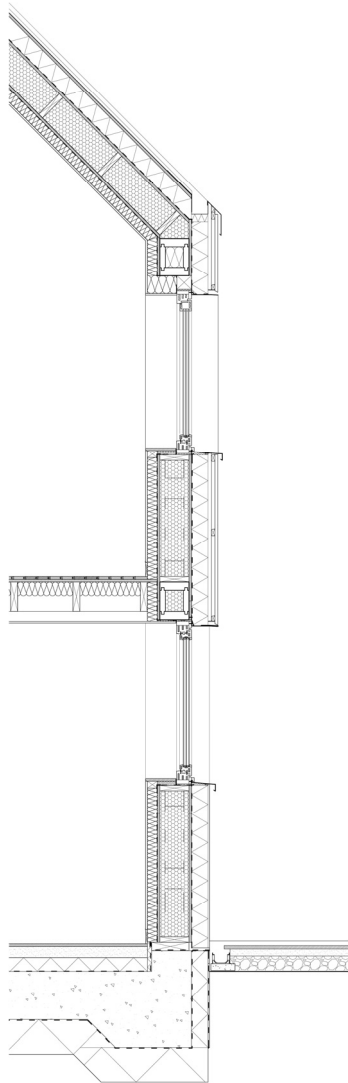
Construction section through southern wall incorporating the multi layers of frame, insulation and membranes
